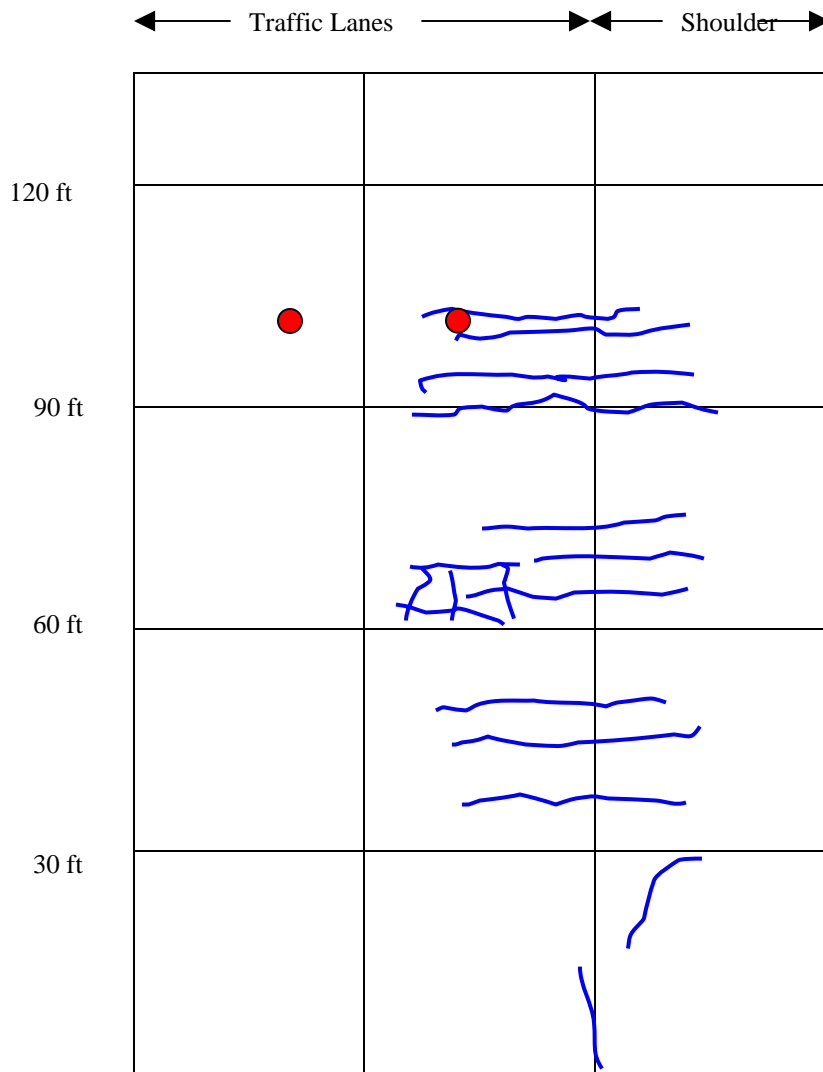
Crack mapping and locations of concrete cores on the north bound lane (up to 120 ft from the south)
